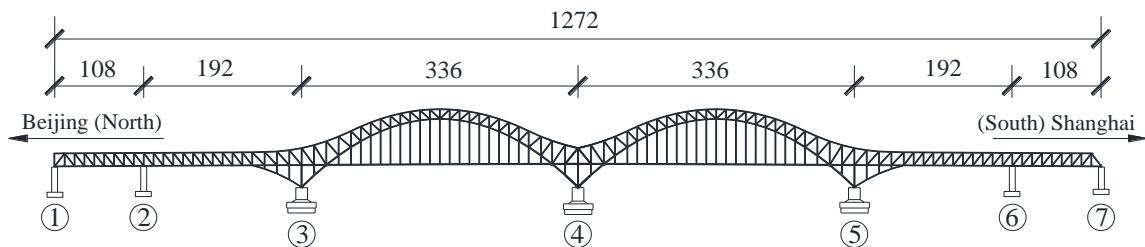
Elevation of the Nanjing Dashengguan Yangtze River Bridge
